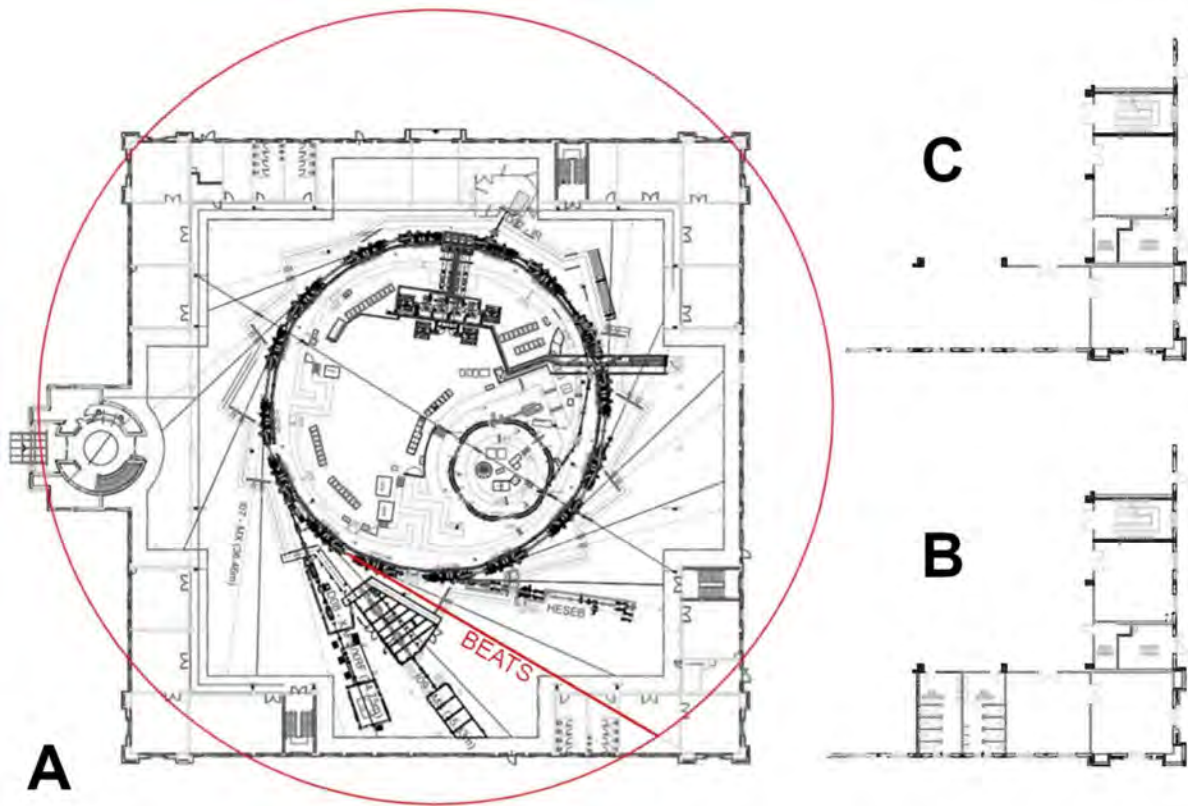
A: Floor plan of the SESAME facility showing the location of BEATS. The red circle indicates the end point of a 45 m long beamline. B: Detail of the current facility floor plan at the future location of the BEATS experimental and control hutches. C: Sketch of the modifications to the SESAME building required to host the infrastructure of BEATS.
